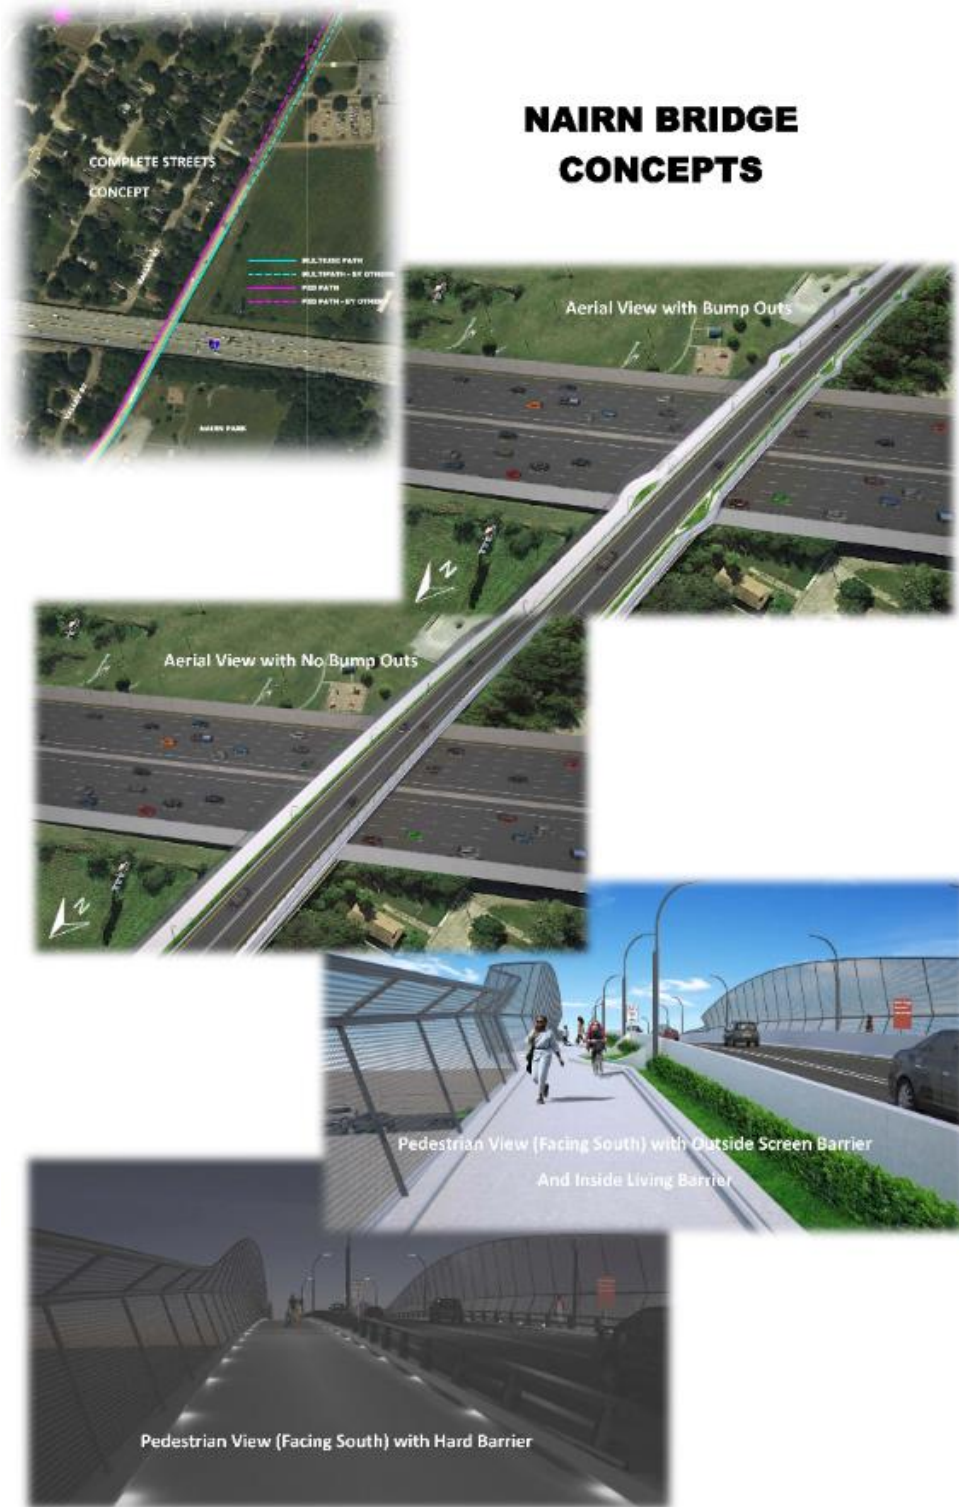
NAIRN BRIDGE CONCEPTS
